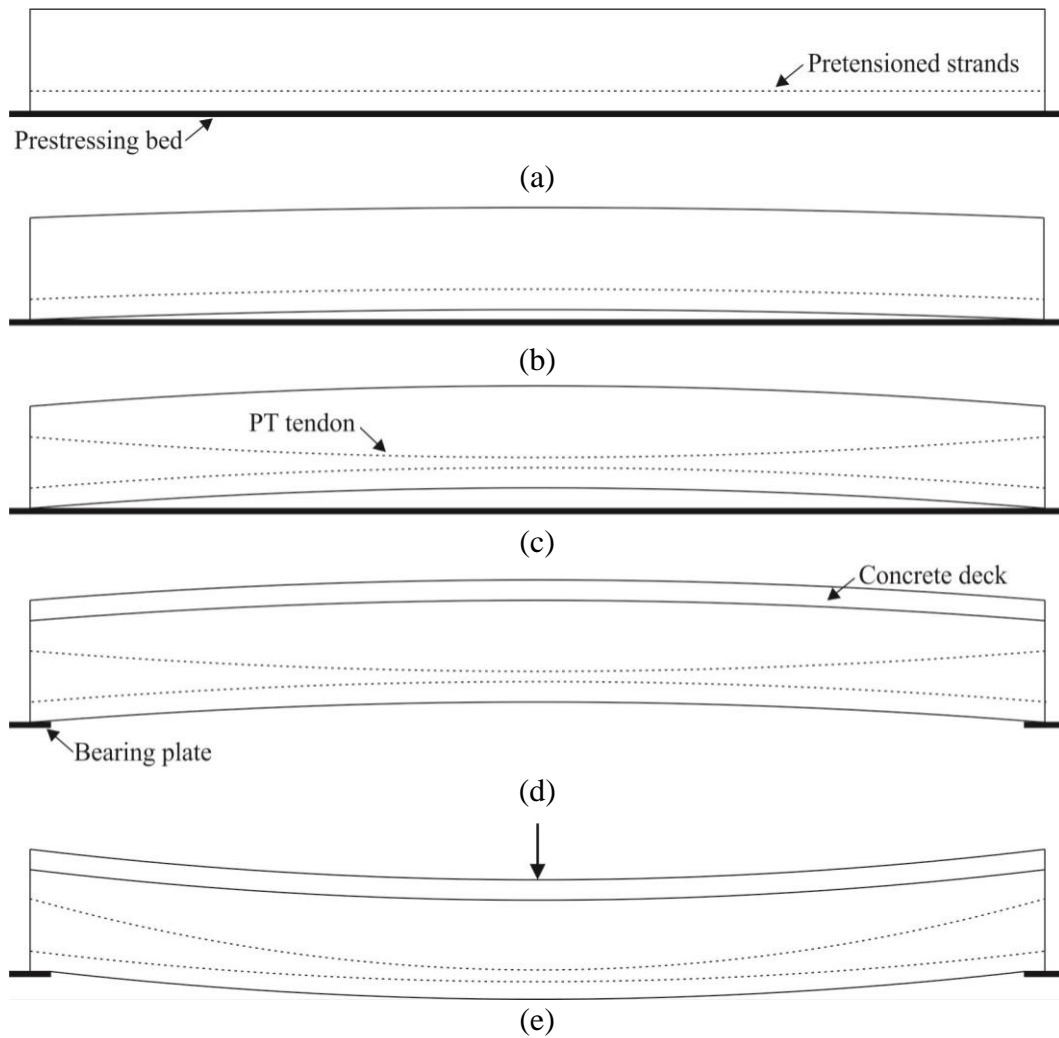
Construction stages for simply-supported beams: (a) application of gravity to girder placed over prestressing bed, (b) pretensioning, (c) post-tensioning, (d) girder on bearing plates, addition of concrete deck and post-tensioning, (e) external loads
